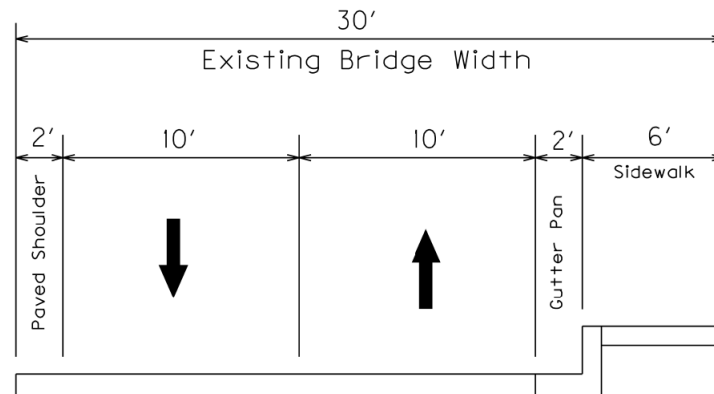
Conceptual Typical Section to Provide a Sidewalk on Existing Russellville Road
